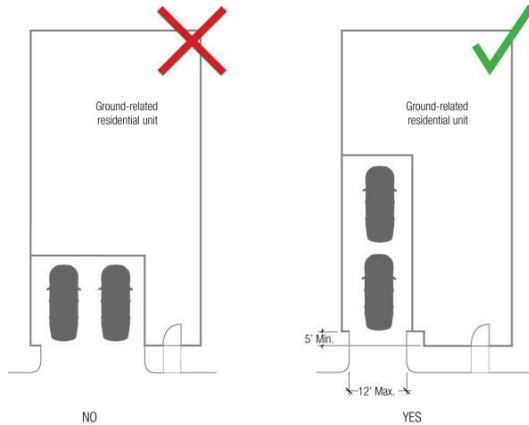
B.3: Driveways serving ground floor residential units shall be no more than 12 feet wide. Tandem parking is allowed (This diagram is for illustrative purposes only. See OMC18.120.240 for stated requirements).
